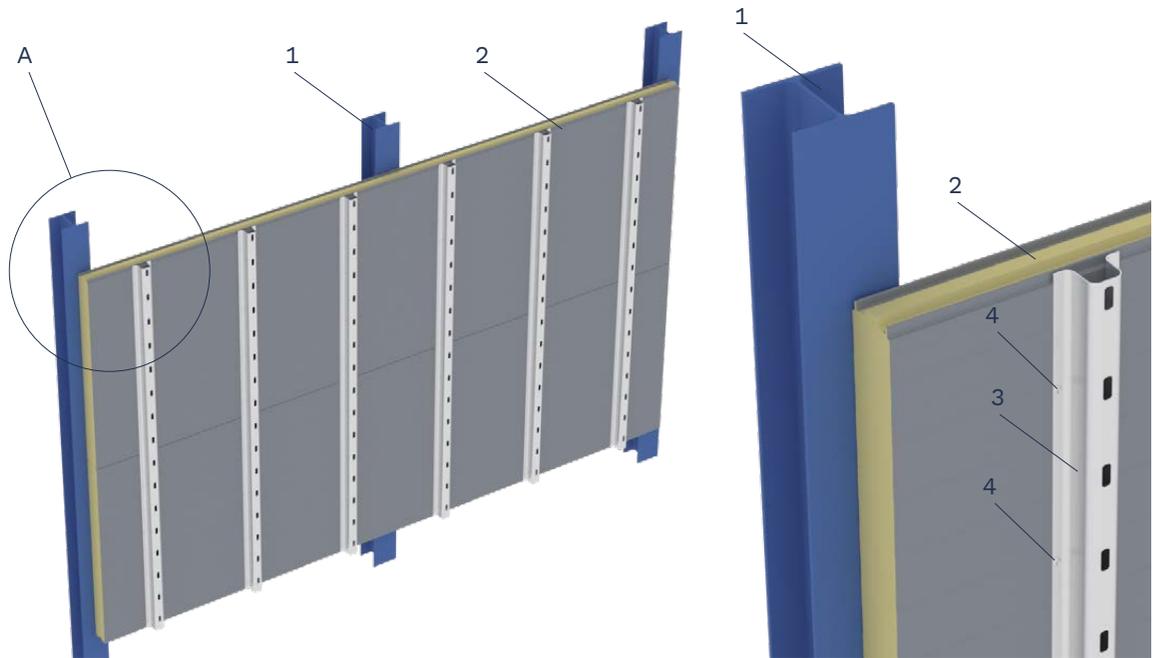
Transversal fixing of suspended facade mounting profiles:
